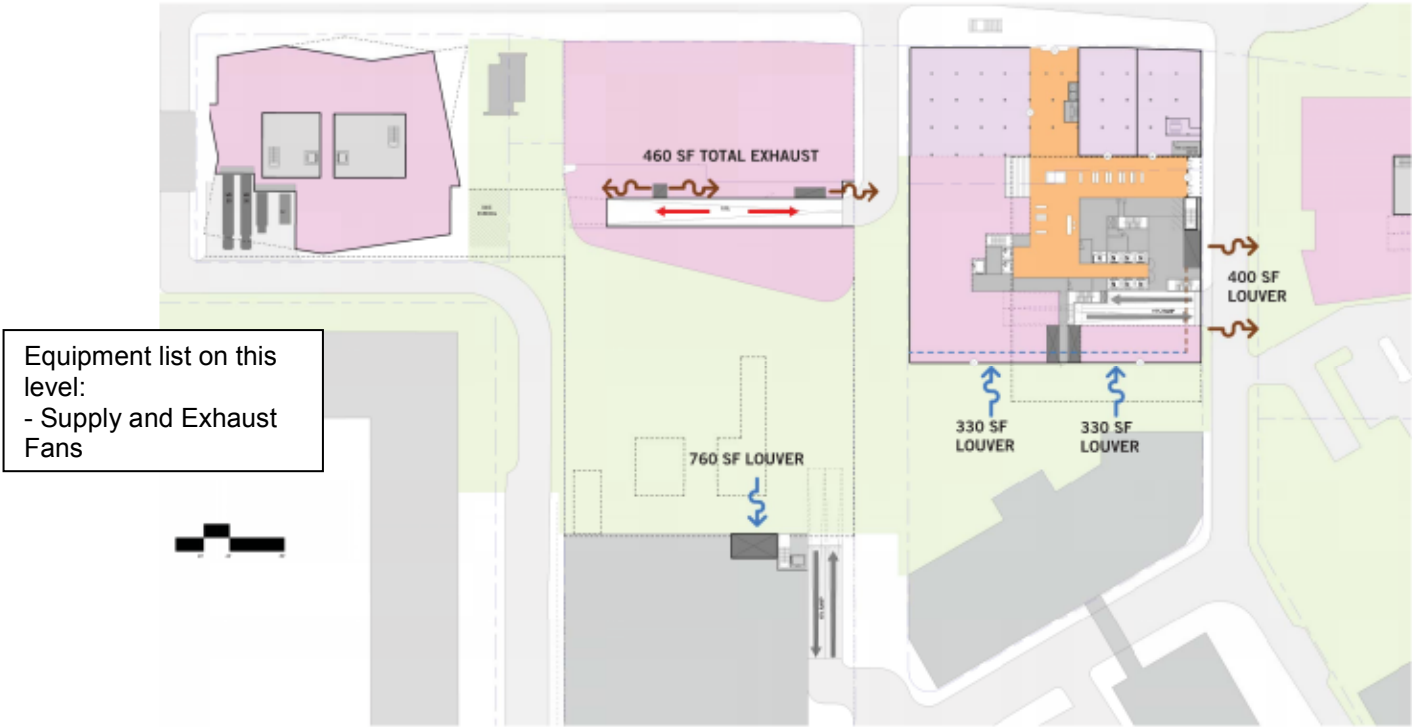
S5. Preliminary Layout of Generator and Mechanical Equipment (Site 5).
